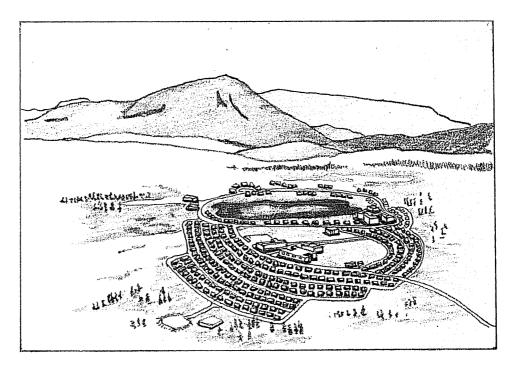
B.2 SITE OF PERMANENT TOWNSITE/CONSTRUCTION VILLAGE (LOOKING NORTH)
